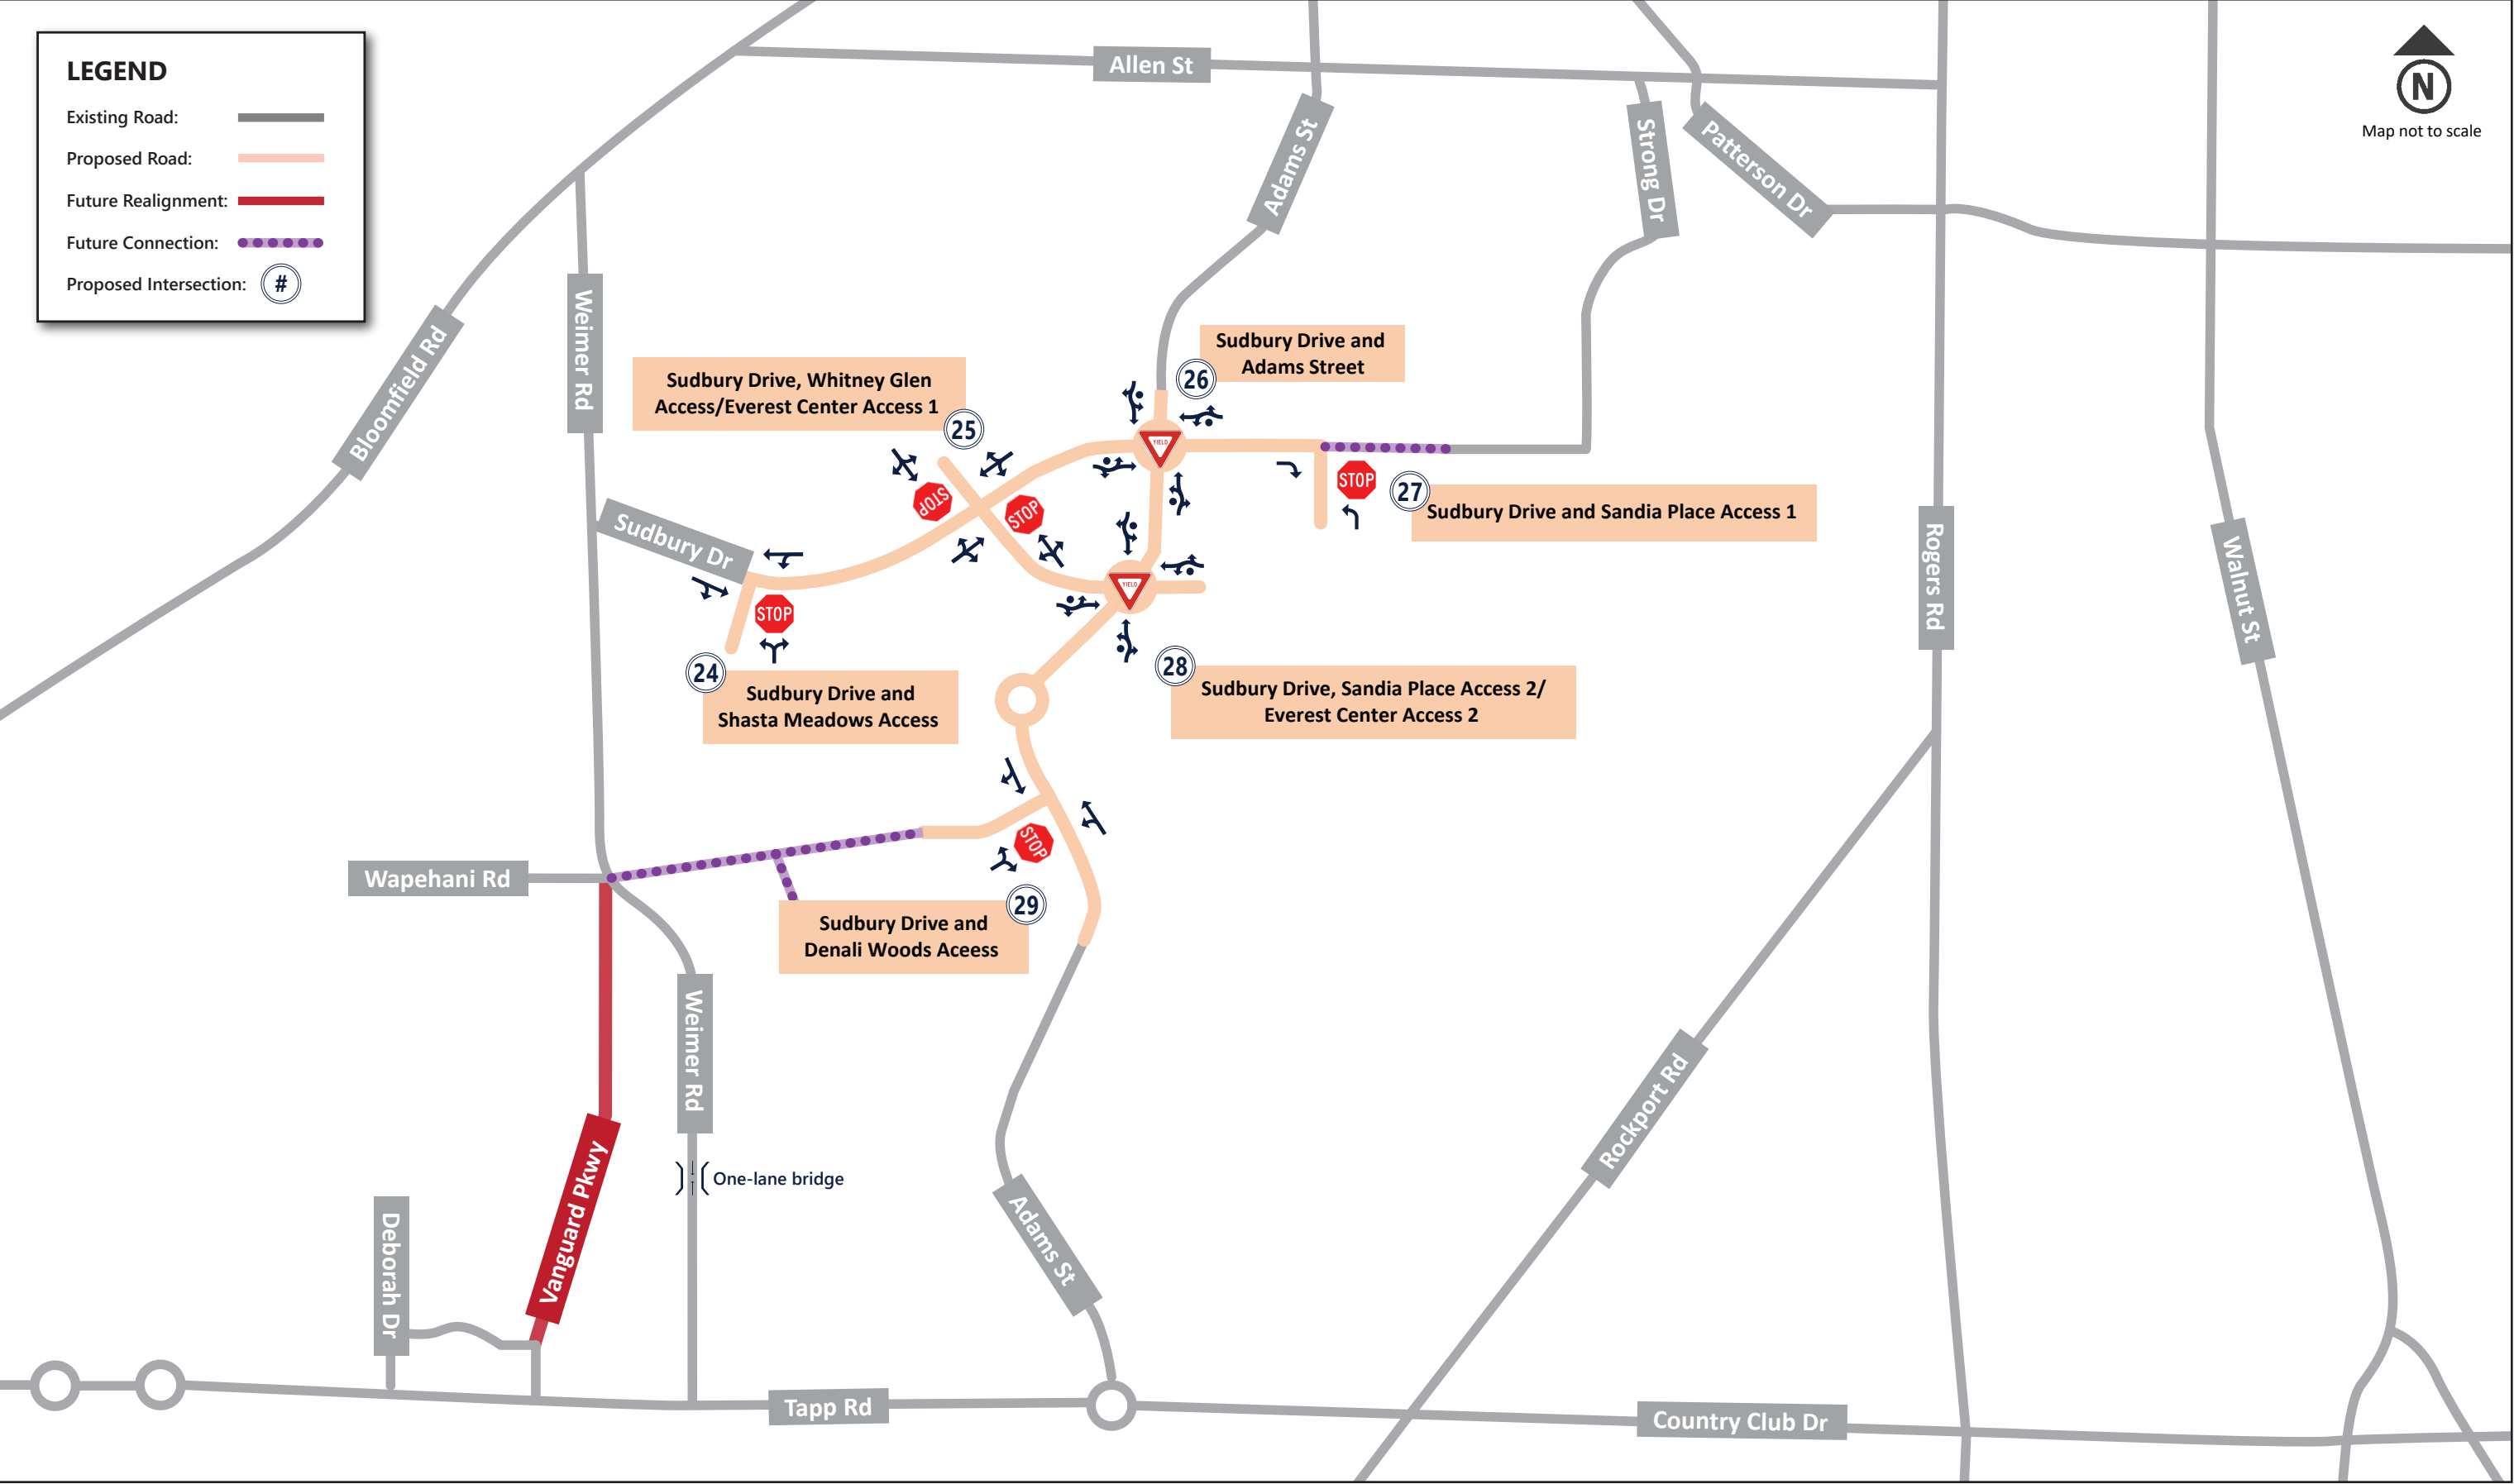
Proposed Intersection & Future Weimer Road Re-alignment
